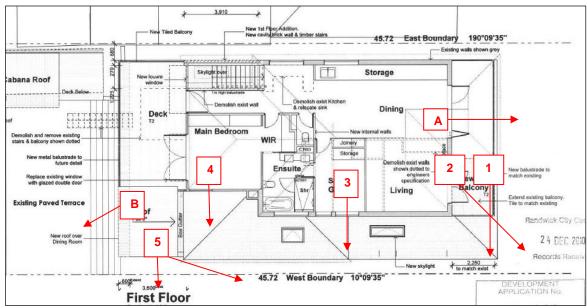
Viewpoint positions on first floor plan No. 344 Alison Road (DA/1147/2010).
